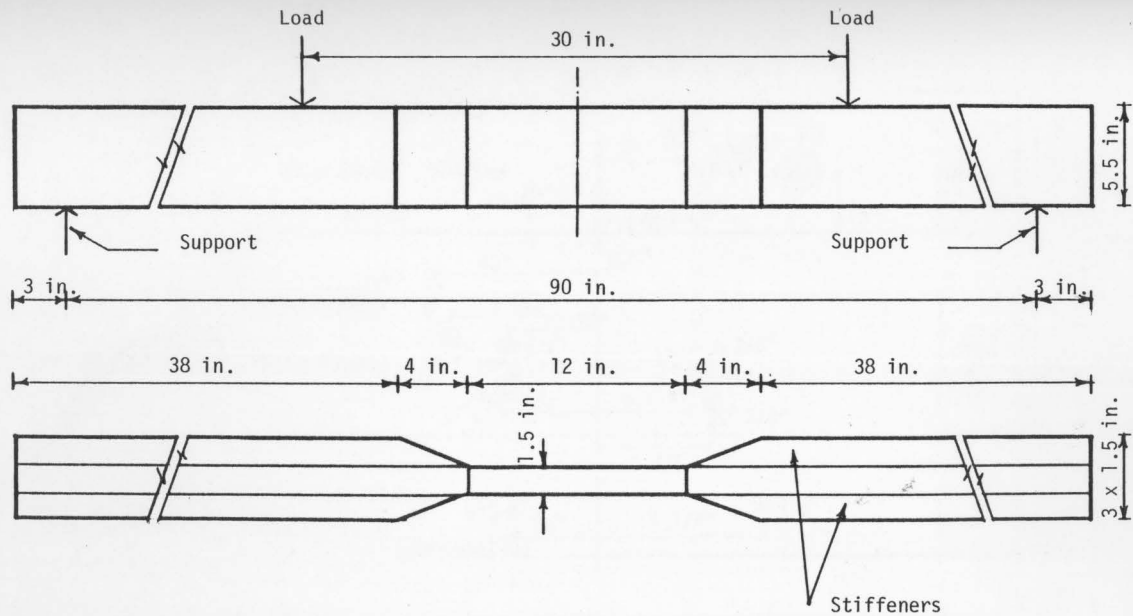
DETAIL OF A 2 x 6 STIFFENED BEAM SPECIMEN
